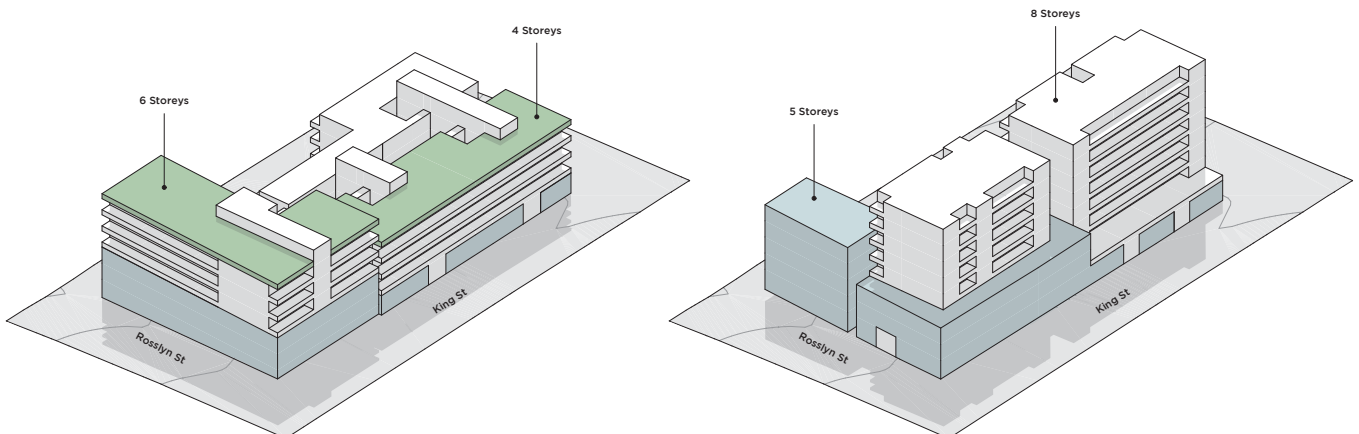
Built form testing to show the proposed floor area ratio and built form controls on a corner site in Spencer (DDO29-1). Images are indicative only to test the proposed controls and are not representative of actual building proposals (*West Melbourne Built Form Testing*, Breathe Architecture).
